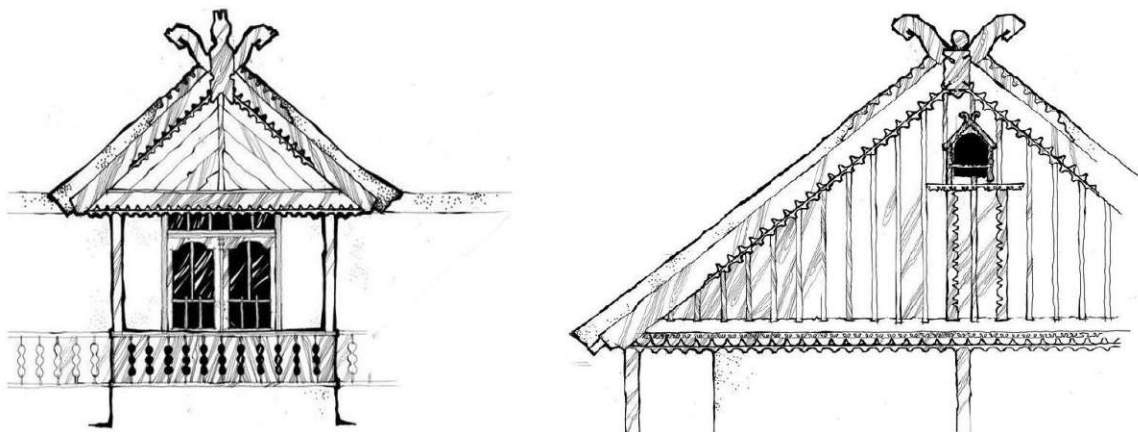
Roof windows (Union of Architects from Romania, 2016)
